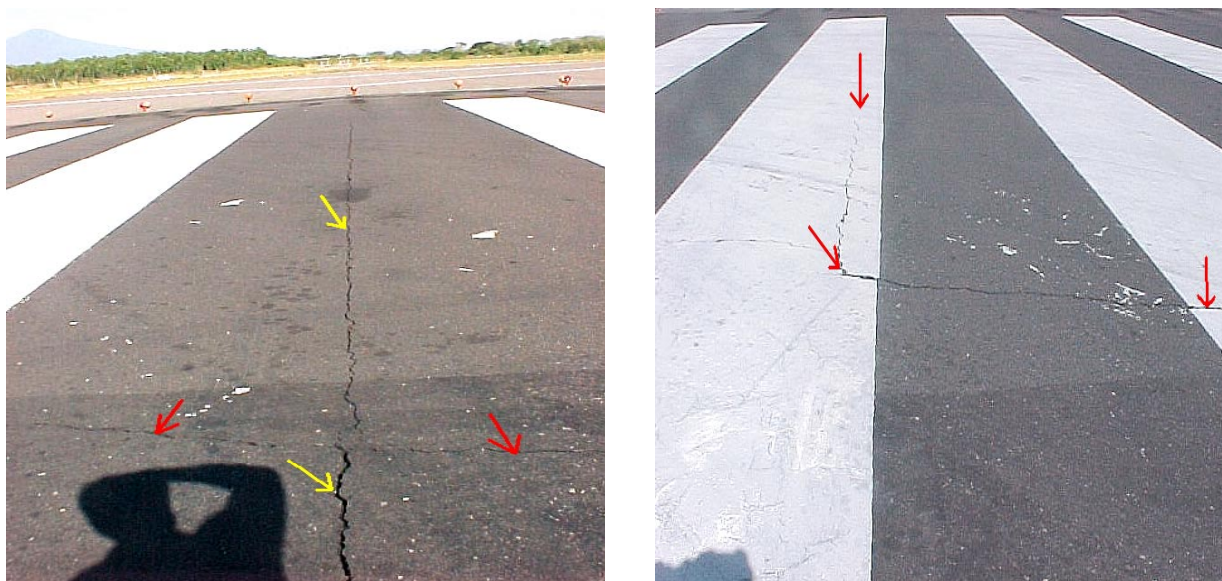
Transverse and longitudinal cracks appeared on runways and their approaches
